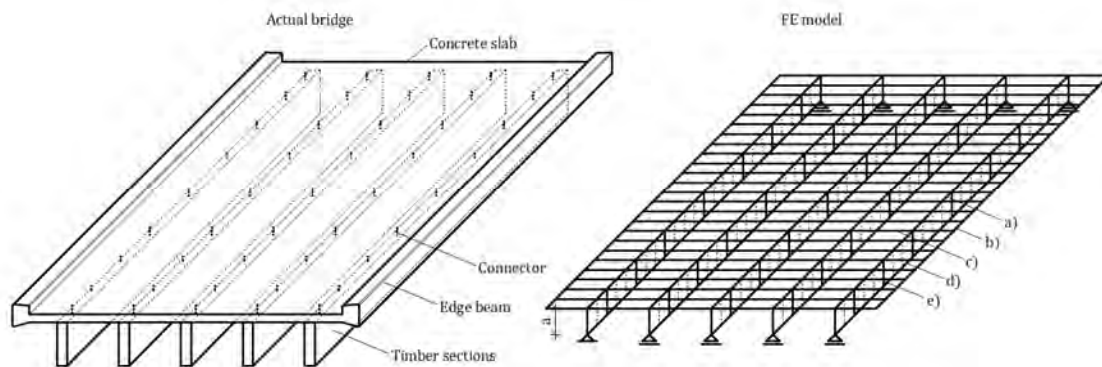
Deck model: (a) longitudinal beams in the grillage, (b) edge beams in the grillage, (c) transverse beams in the grillage, (d) timber beams and (e) connection
